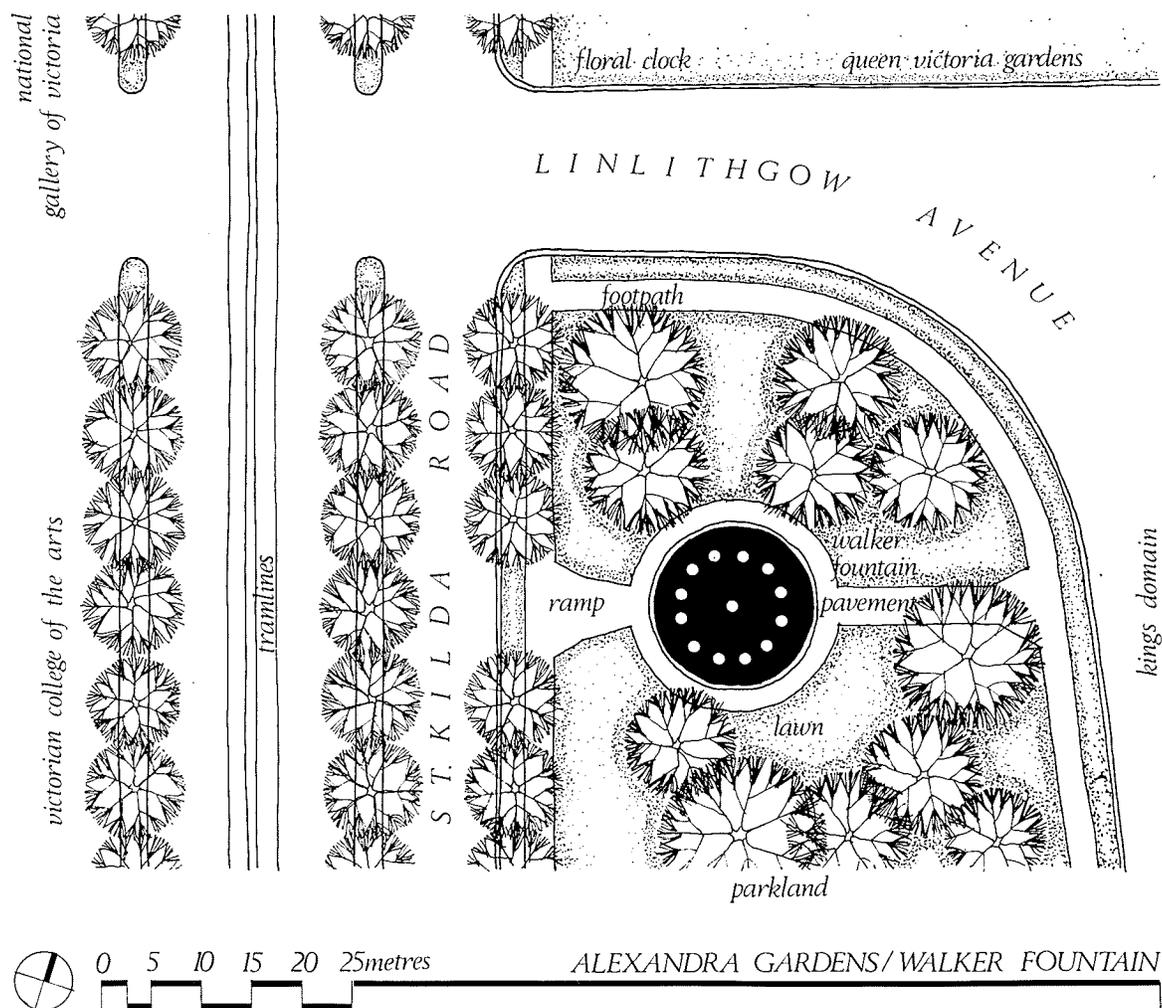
Alexandra Gardens/Walker Fountain -- Site Plan.
